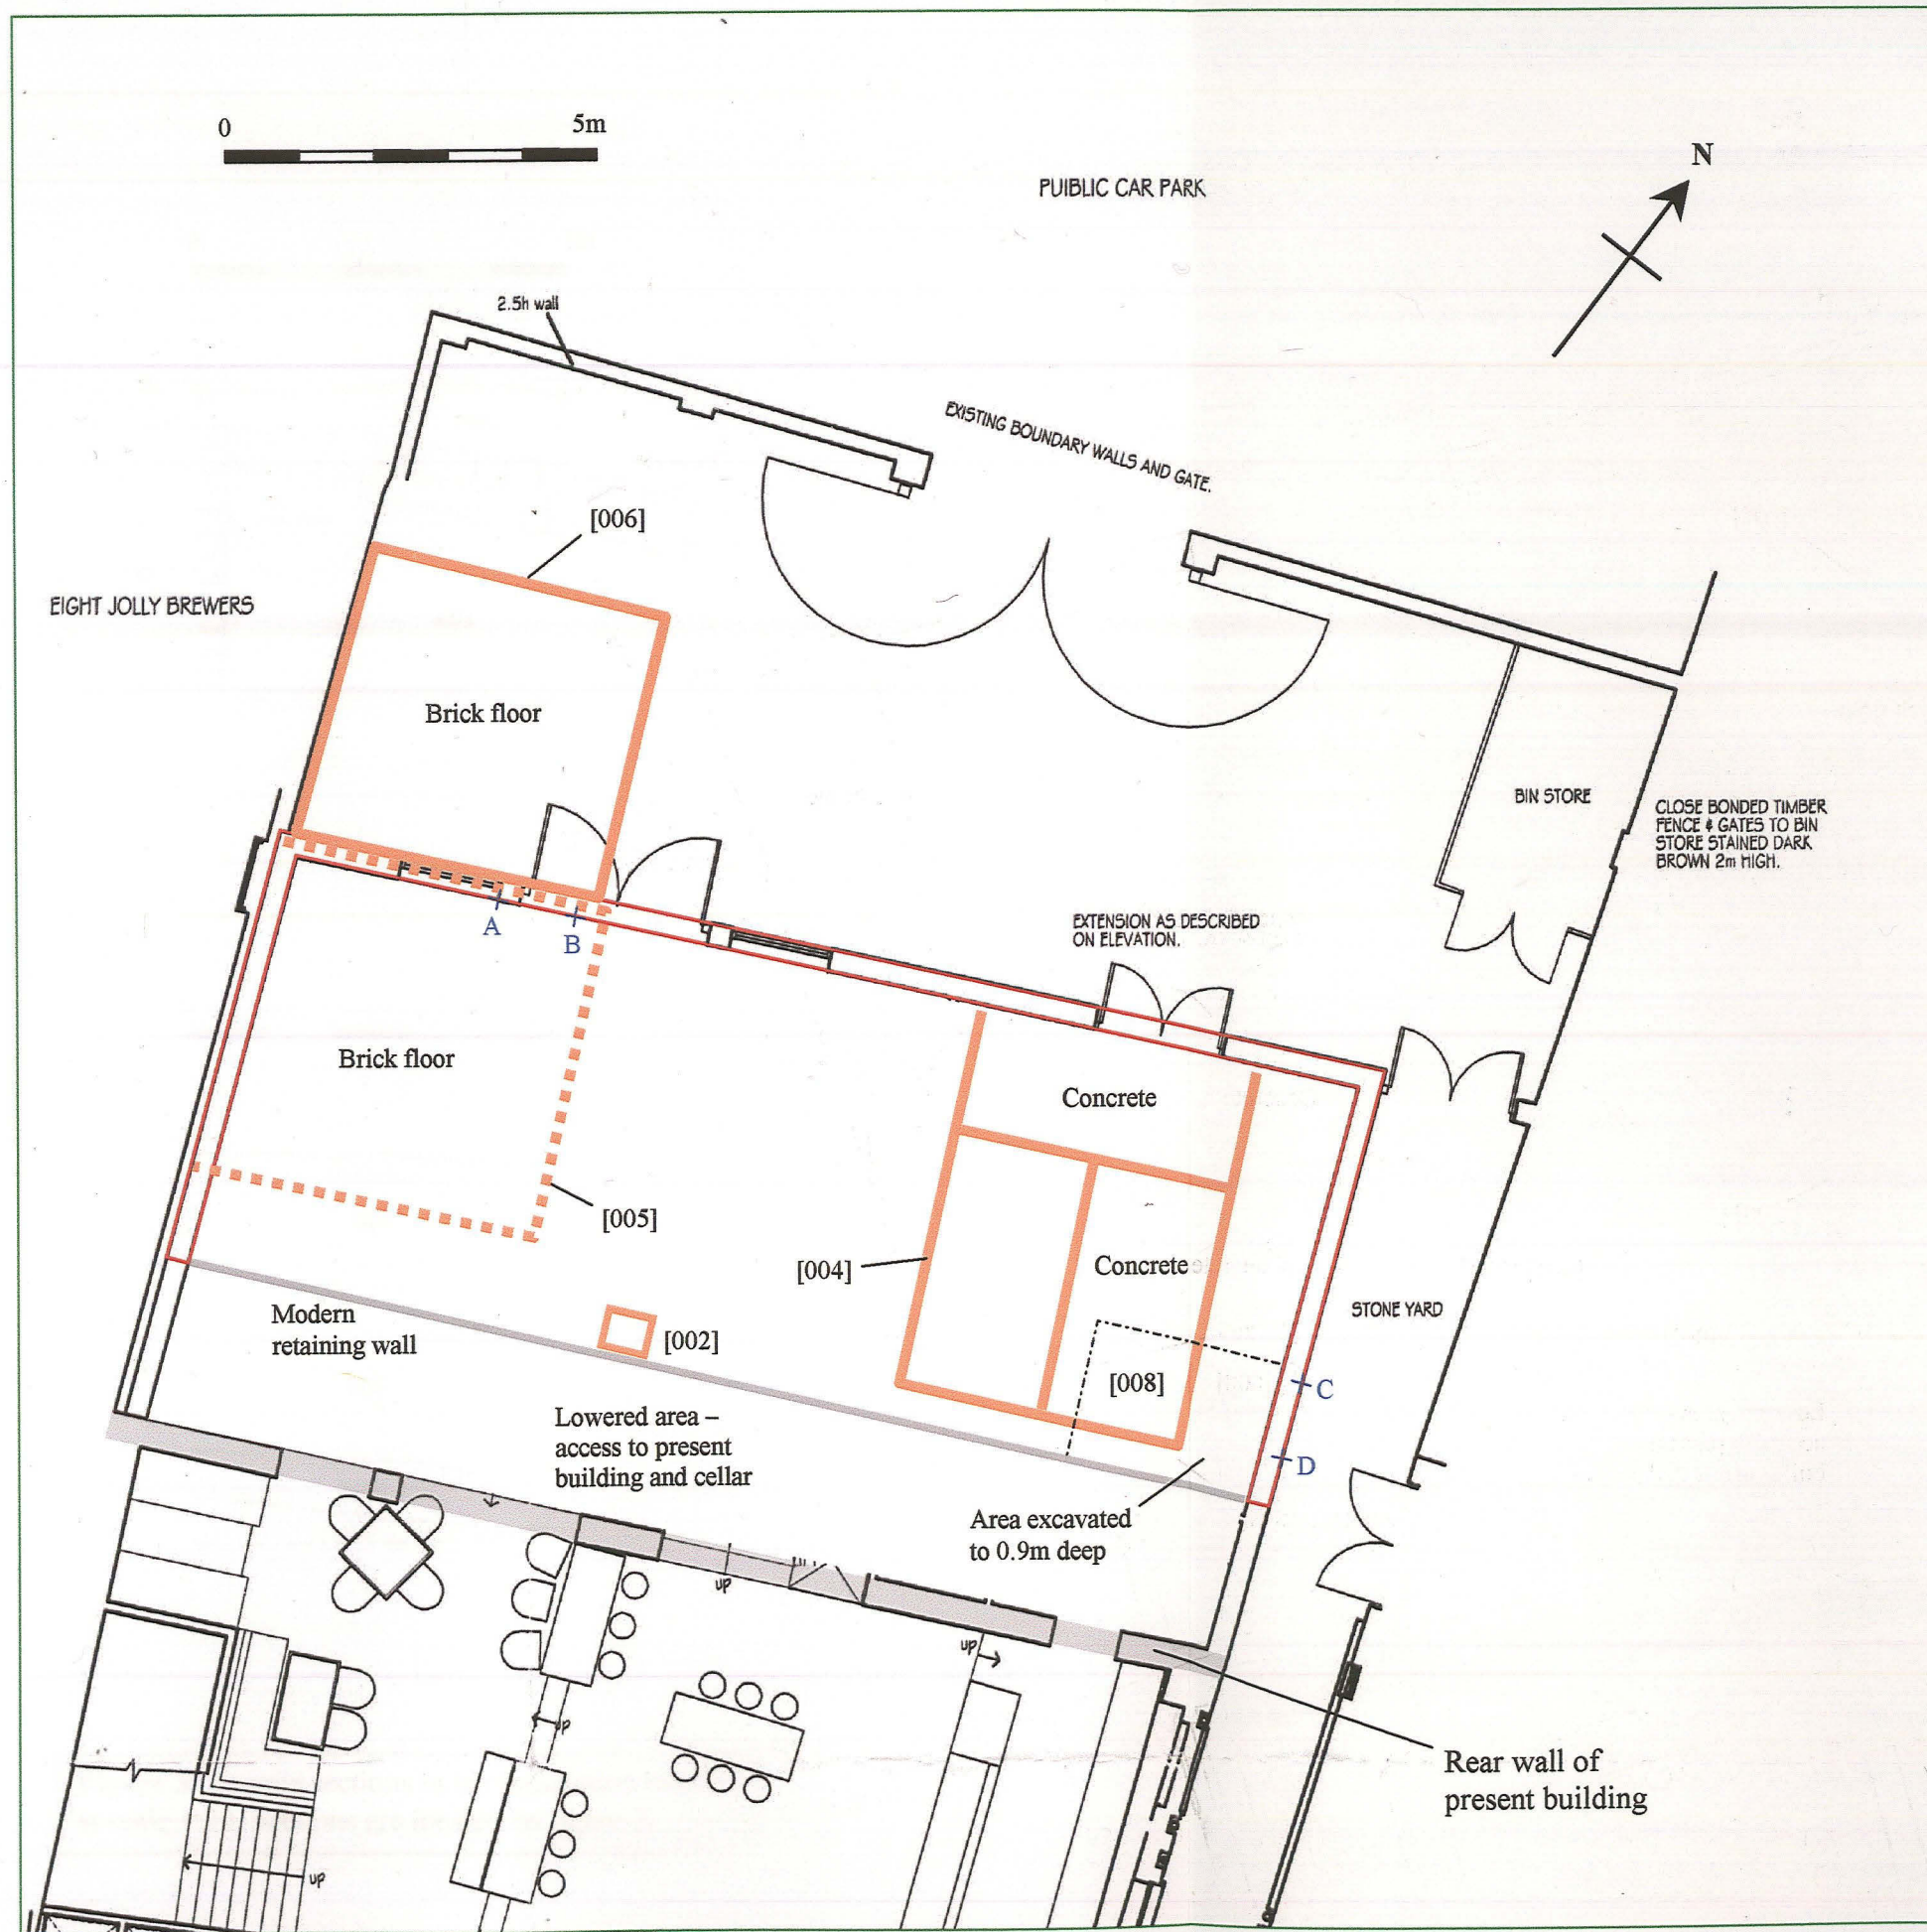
Extract from the architect's plan of the proposed development at scale 1:100, showing the extent of the foundation trench in red and the structures exposed during the groundworks in orange.
